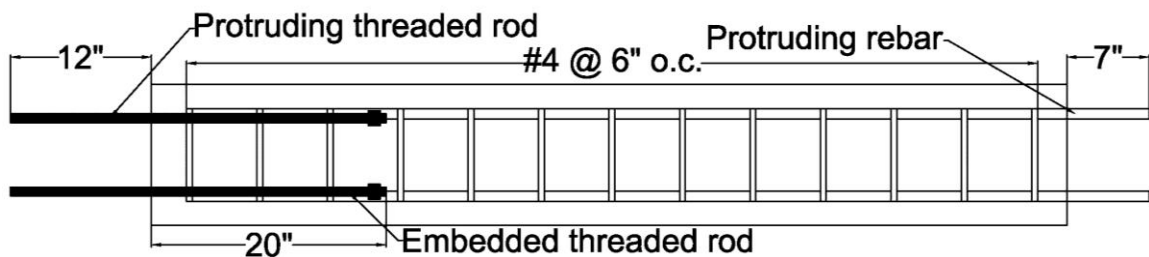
Protruding Threaded Rod and Rebar Details of a Pier
